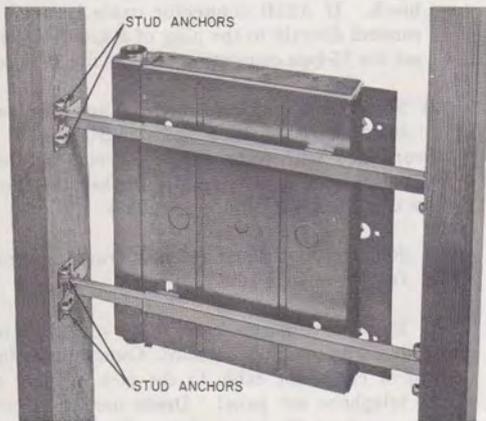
Typical Installation of 113D Apparatus Box, Rear View
